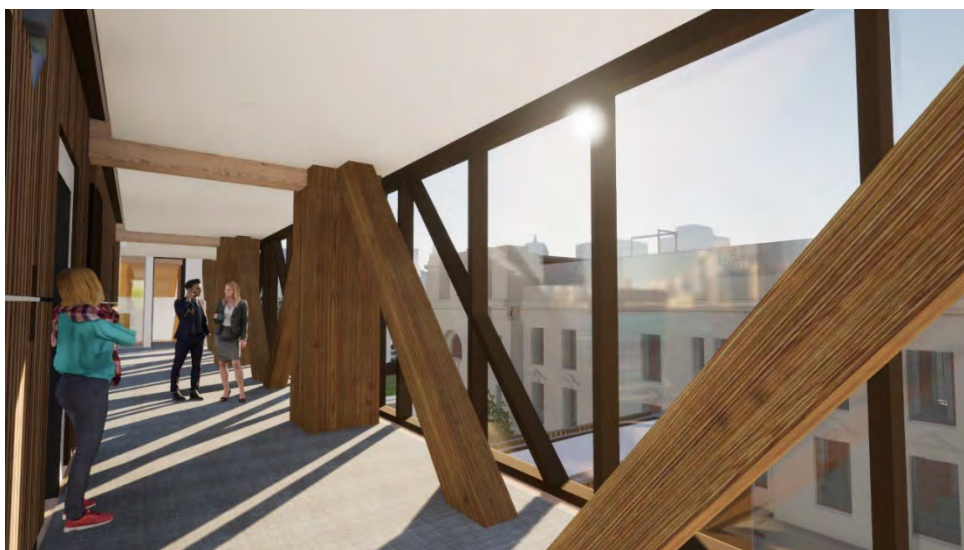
Render view from Museum Street Building (source: Studio Pacific Architecture)
